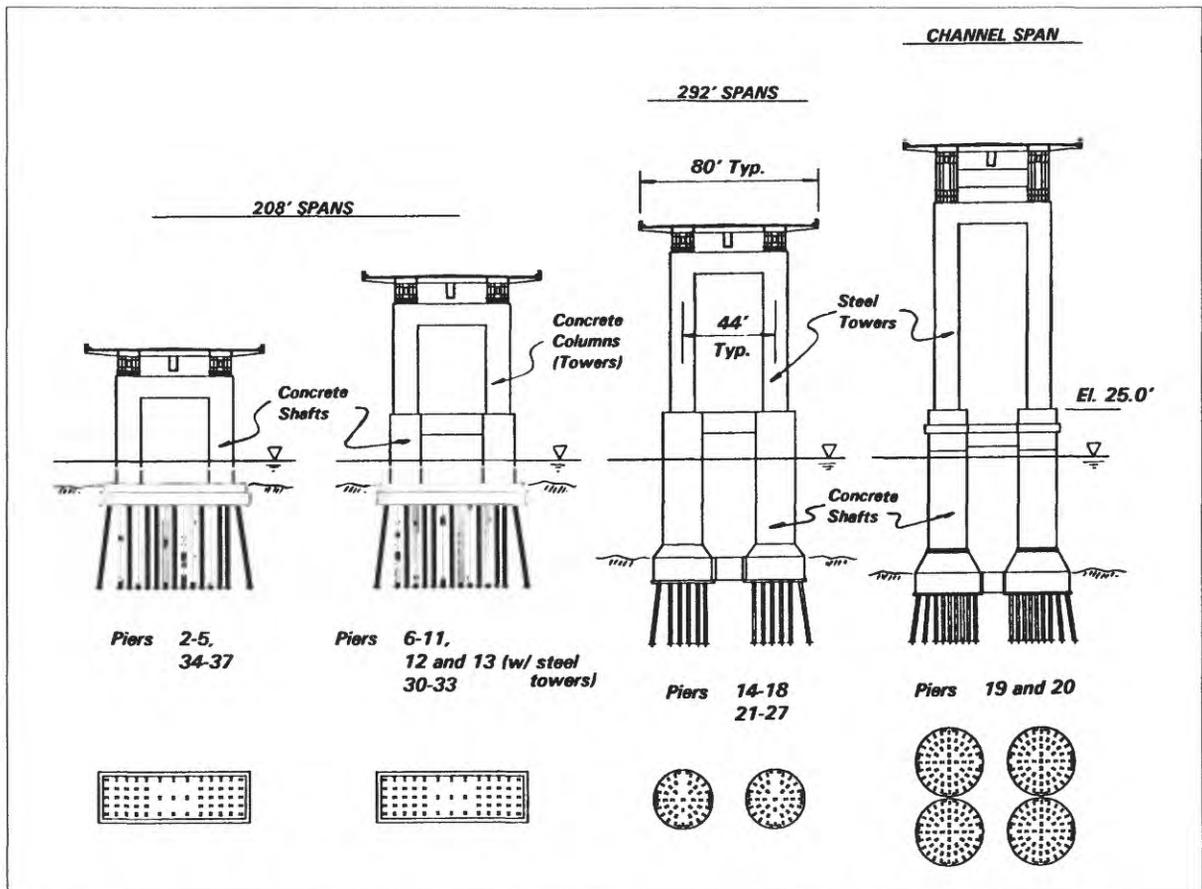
Piers for steel superstructure at San Mateo-Hayward Bridge (courtesy of the Cygna Group).
